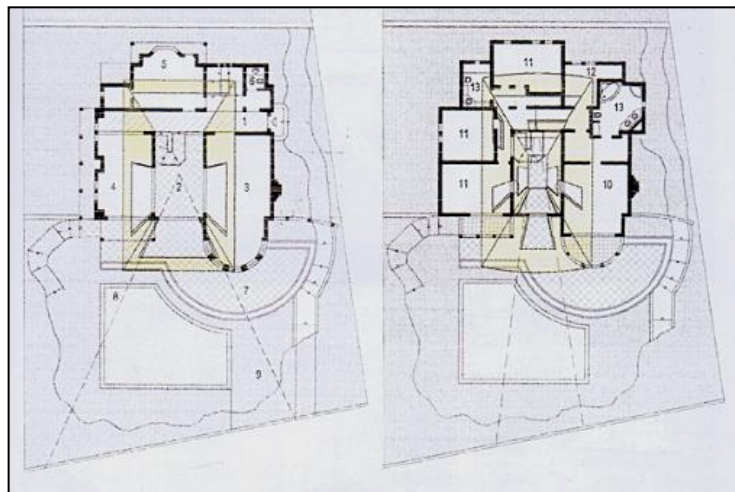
Floor plans of M. Naibi villas, 1993 [162]
